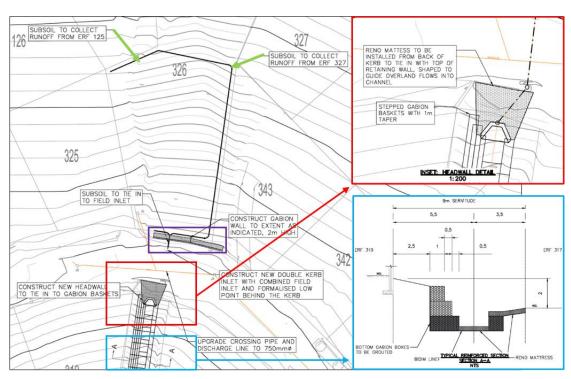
Erosion protection layout for Erven 326 & 318 – subsoil drains, gabion basket and reno mattress (source: EAS Infrastructure Engineers).
